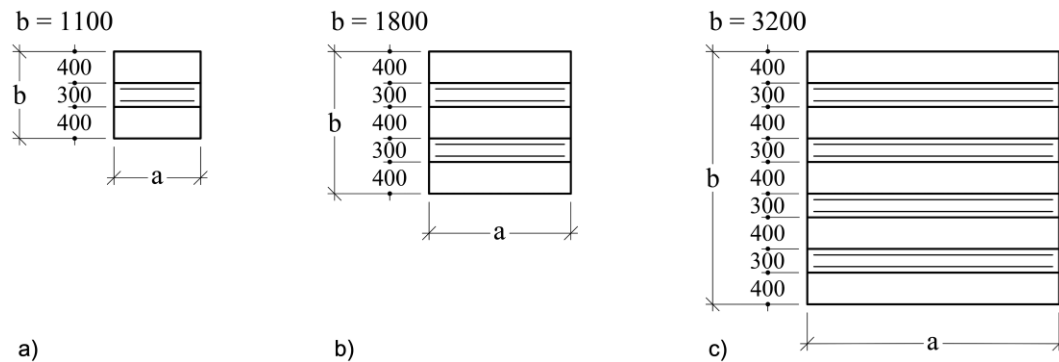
Dimensions and arrangement of the stiffeners in panels in the parametric study: a) 1 stiffener ($n_{st} = 1$); b) 2 stiffeners ($n_{st} = 2$); c) 4 stiffeners ($n_{st} = 4$)
